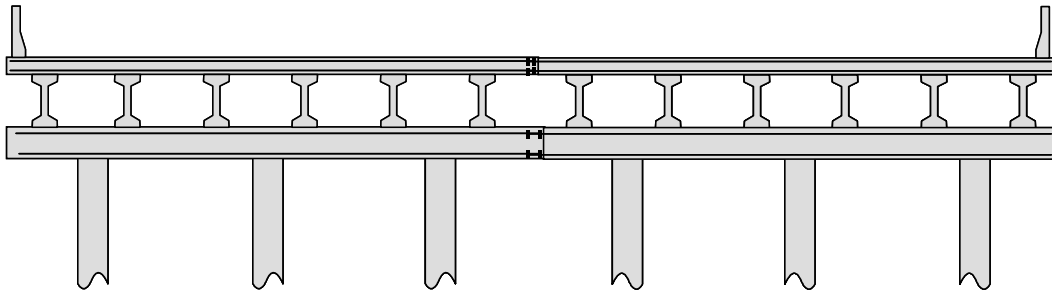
Existing Bent Cap Widening Using Headed Reinforcement
